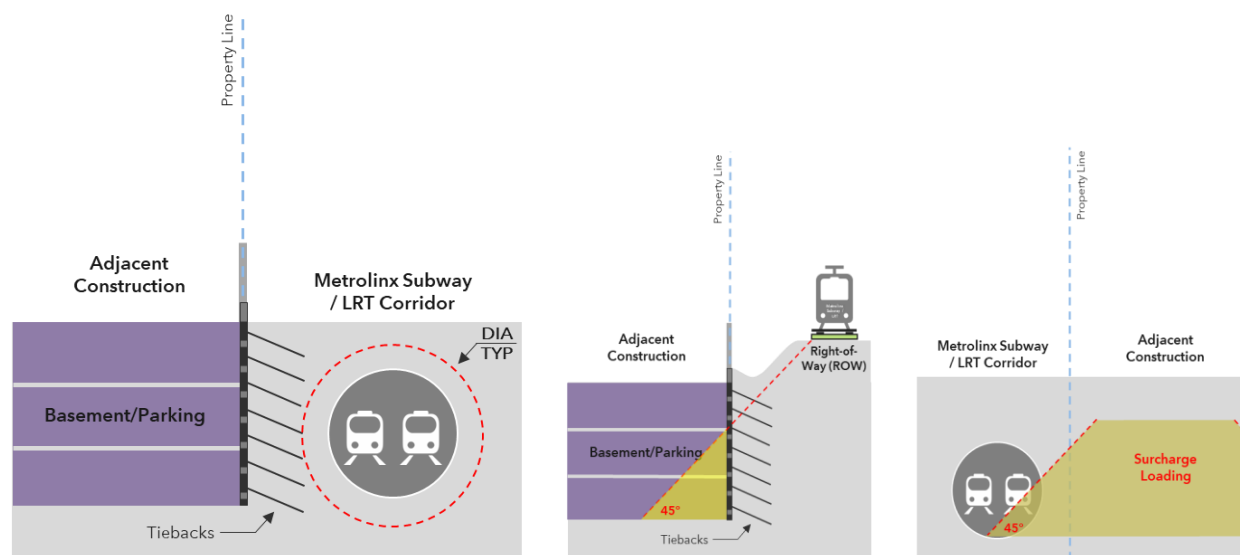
Applicant Infrastructure that Encroaches into with the Geotechnical ZOI of Metrolinx Infrastructure
